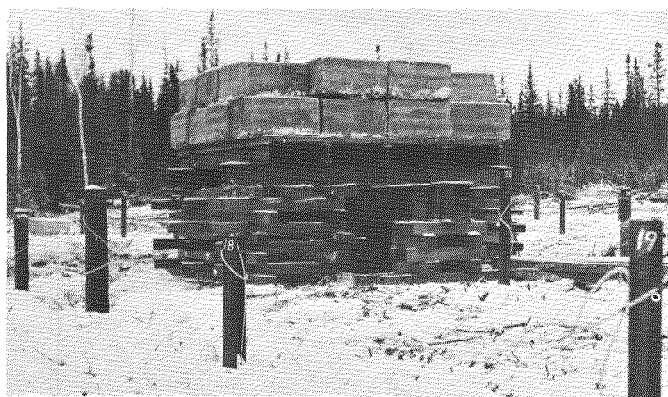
Pile load tests in Site C, Fairbanks, Alaska
